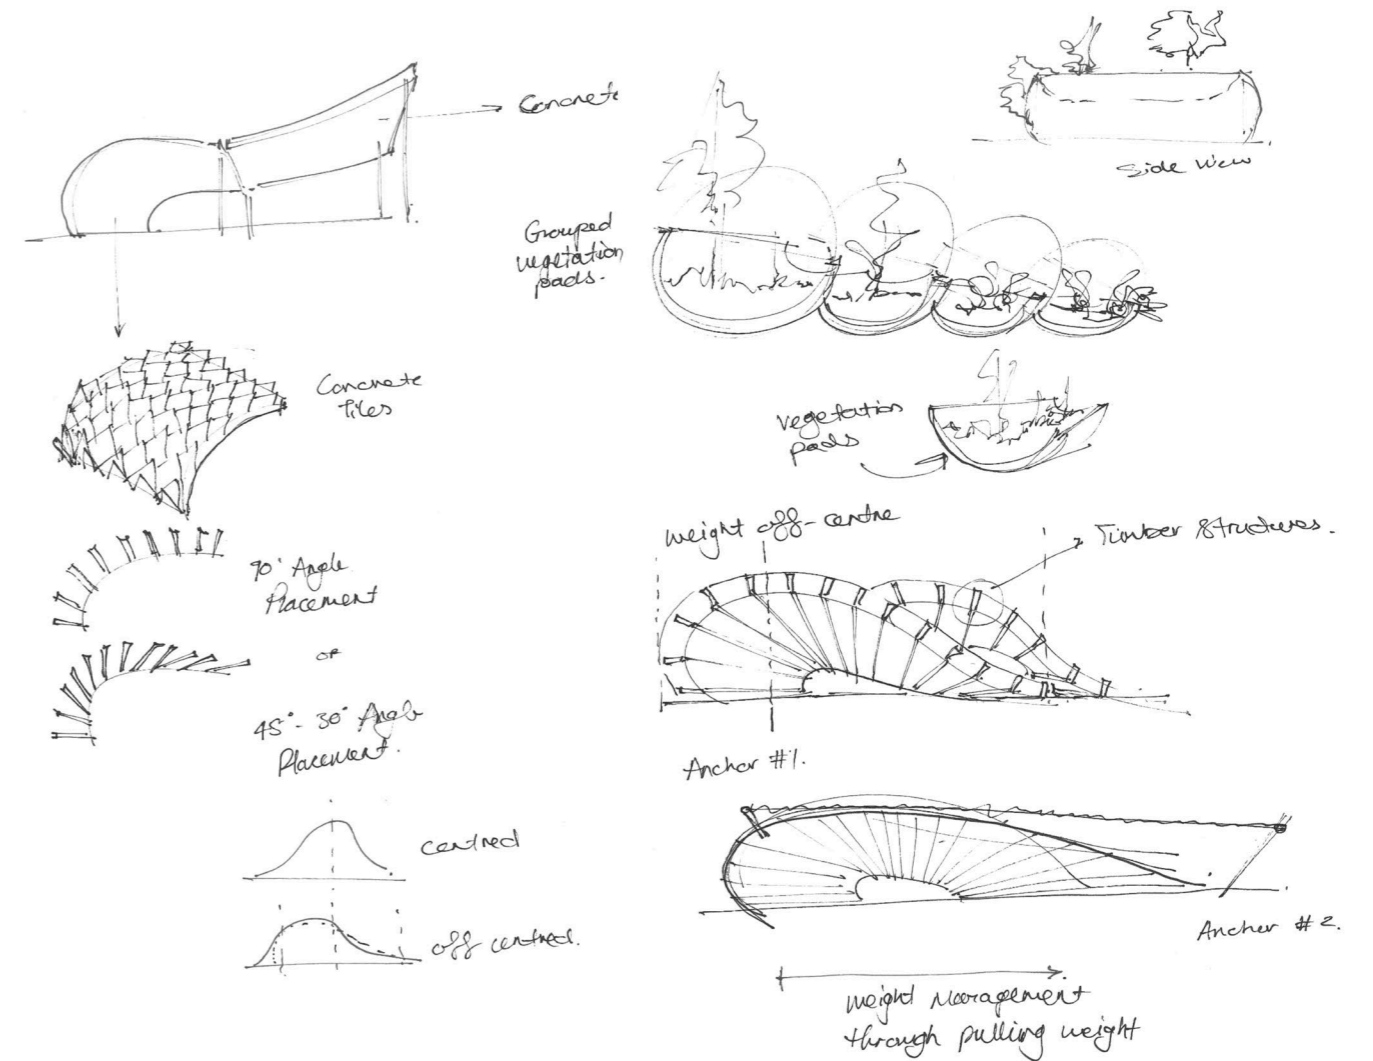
Facade details and exterior concepts through hand-drawn sketches.
